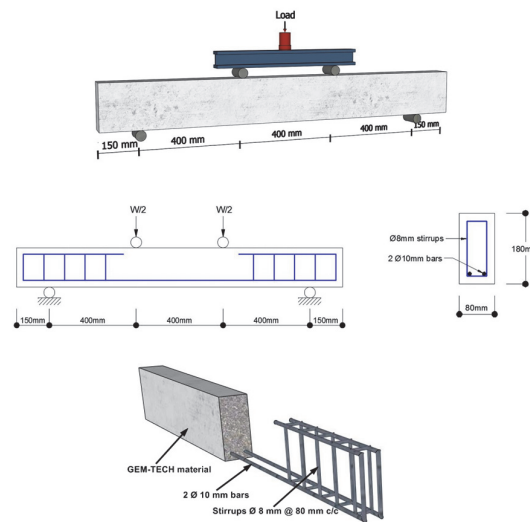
Four-point loading arrangement of beam and reinforcement layout
